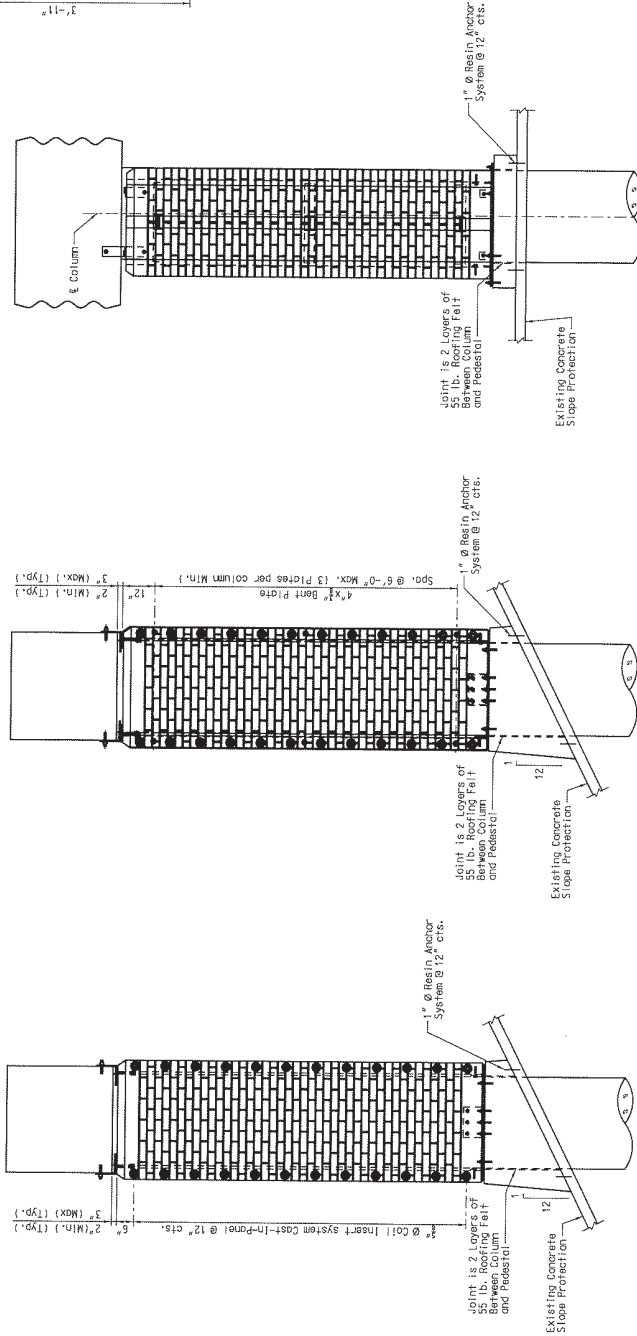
DETAIL OF RESIN ANCHOR SYSTEM IN EXISTING CONCRETE SLOPE PROTECTION
